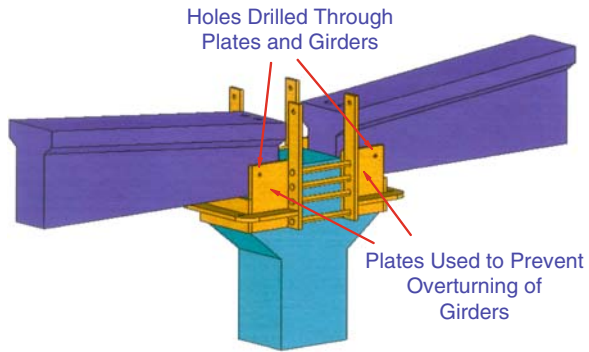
Details of strengthening scheme for interior connections (See also Plate 11 in Color Plate Section on page 461)
